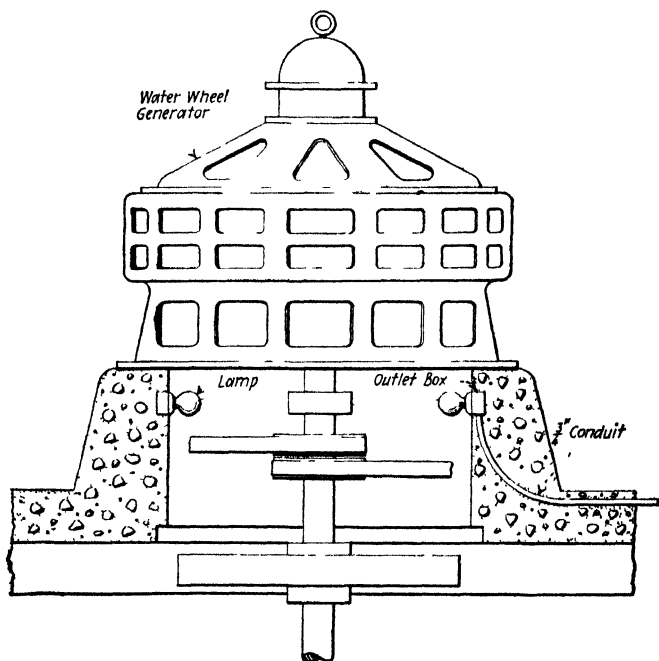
Conduit wiring on interior of the foundation of a hydraulic-turbine driven generator.
